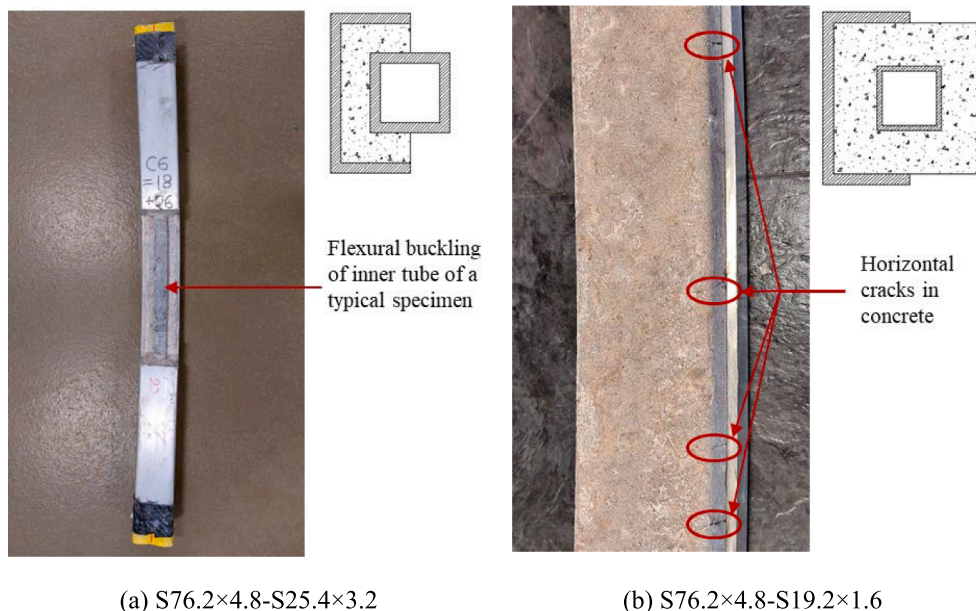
Failure pattern of (a) the inner tube of a typical CFDSAT specimen, (b) the concrete infill of a typical CFDSAT specimen.
